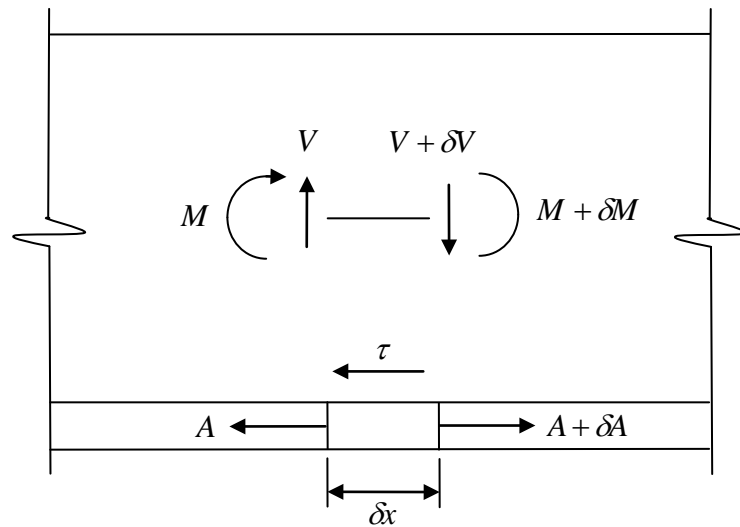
Resultant Forces in Plated Concrete Beam
